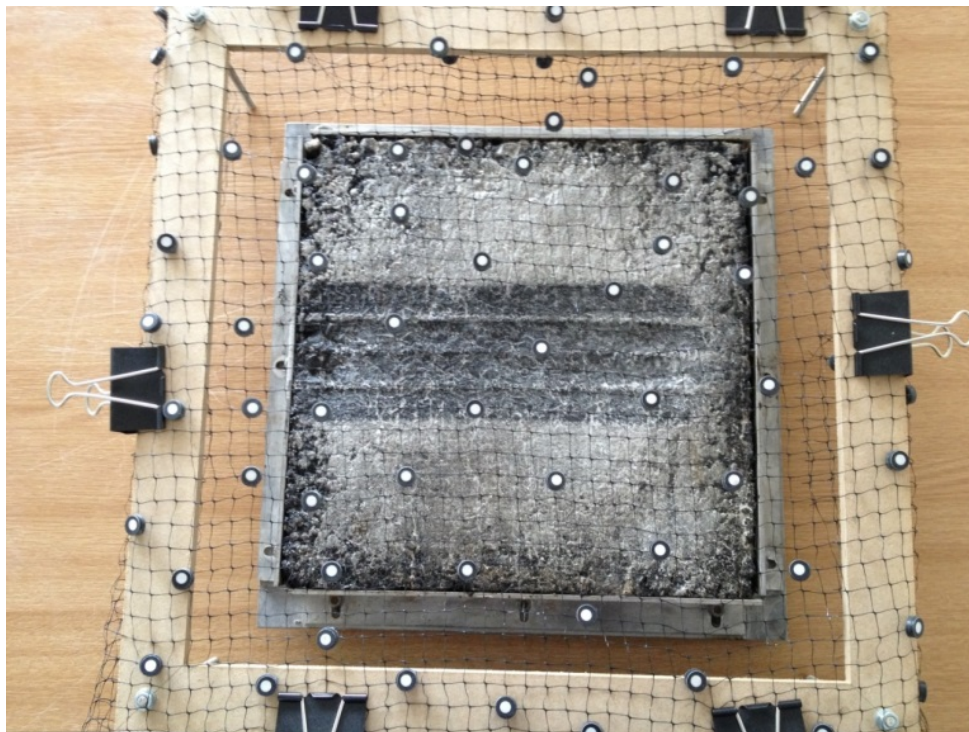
Asphalt mix test specimen in reference mould ready for 3D laser scanning.
